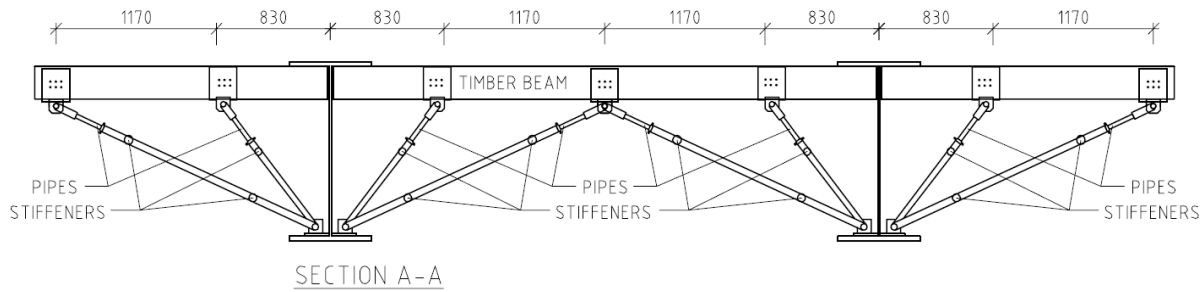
Cross section of girders with attached formwork (BRITEK Ltd)
